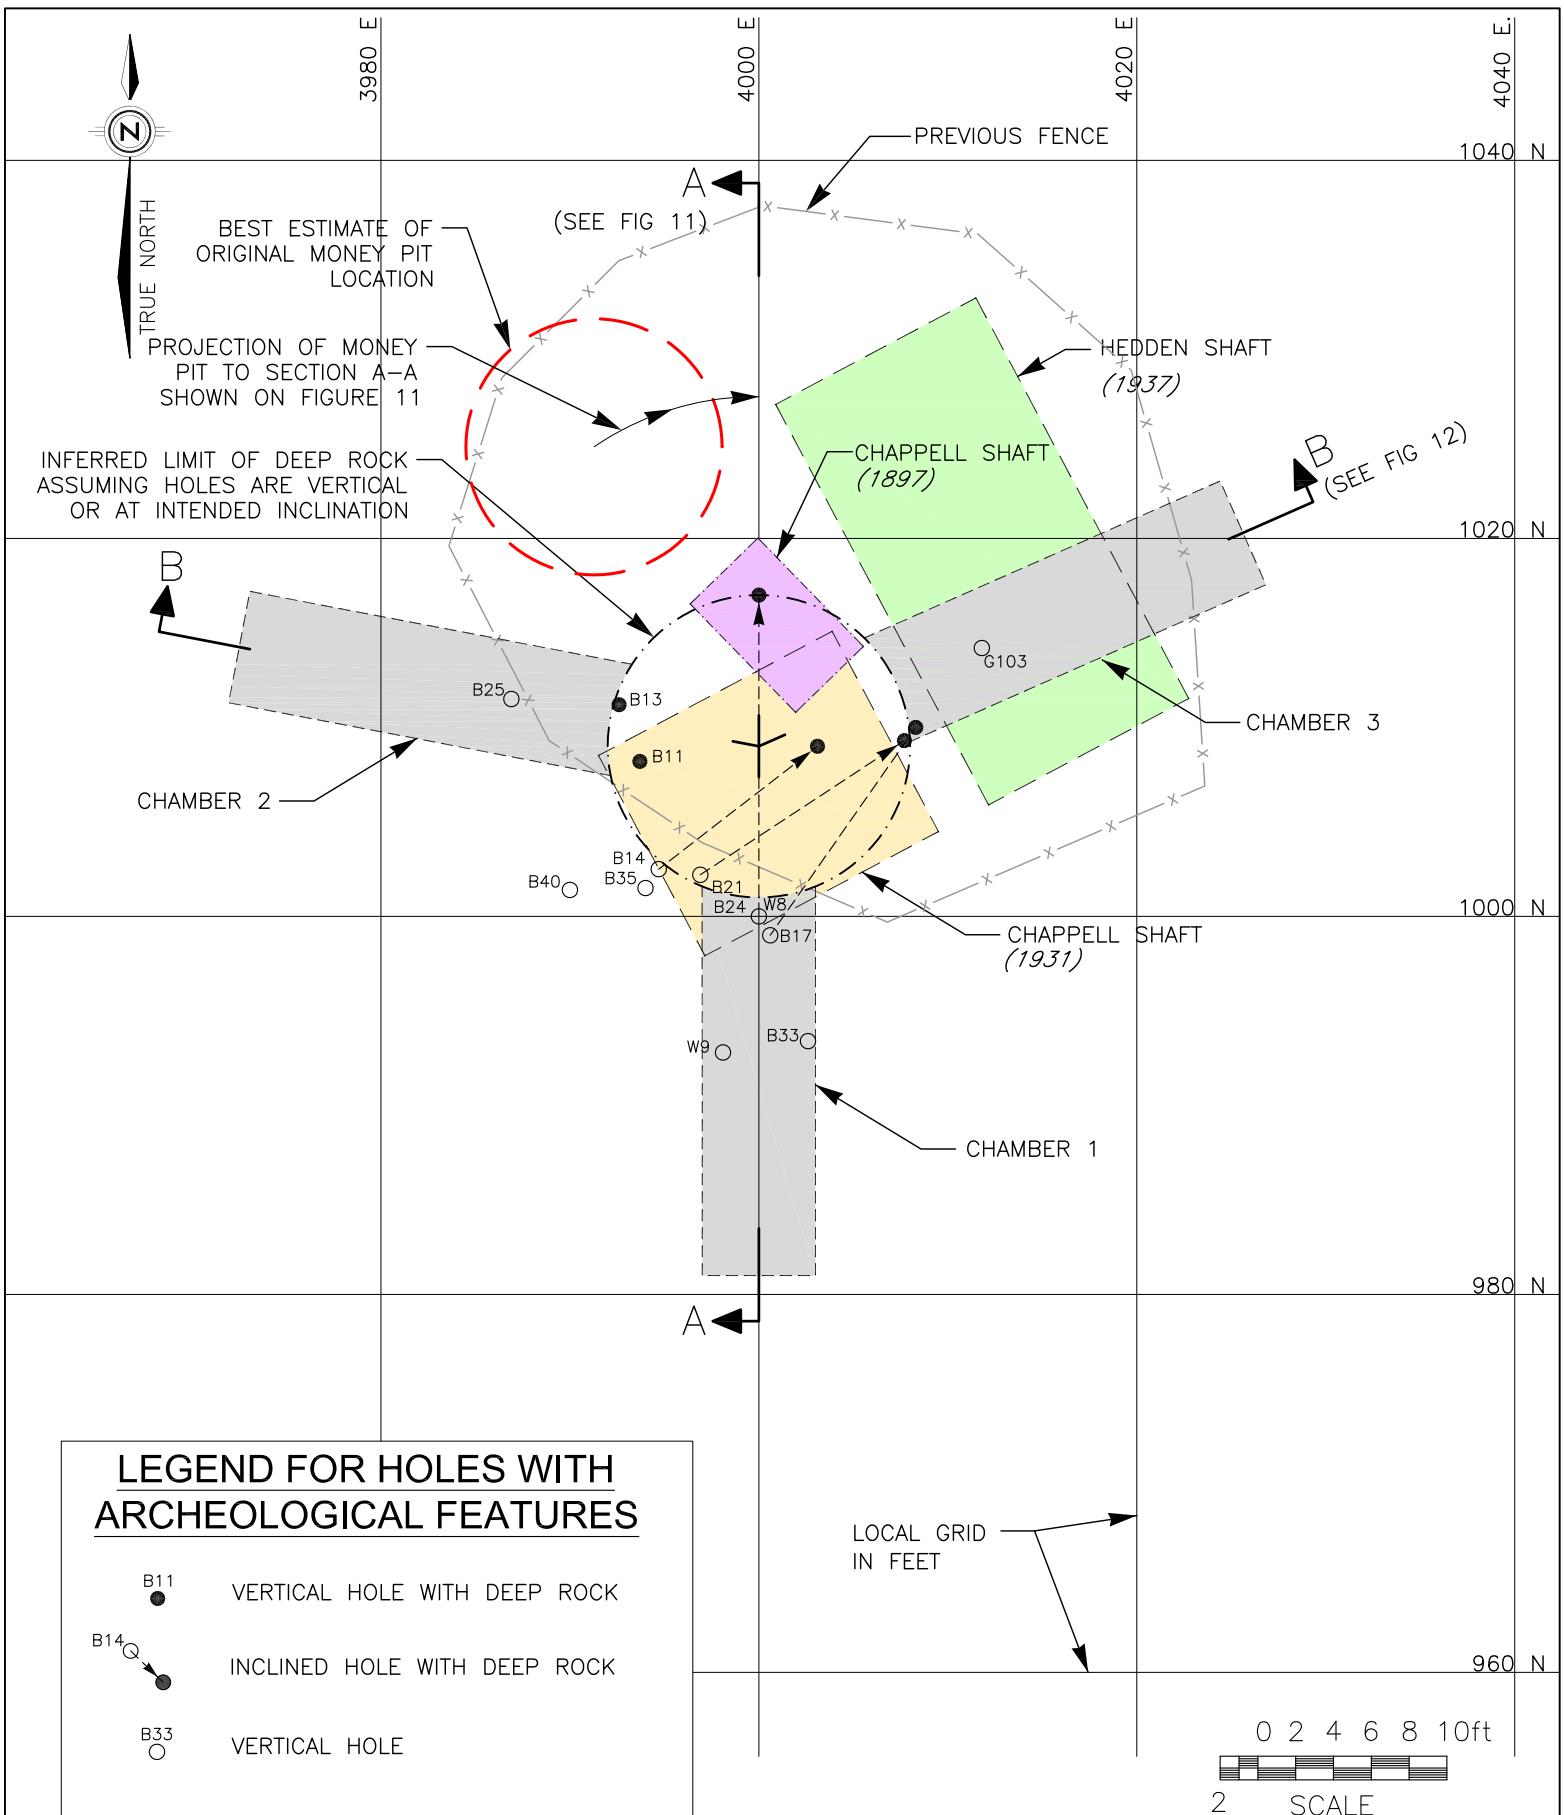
PLAN SHOWING MONEY PIT RELATIVE TO DEEP ROCK AREA AND CHAMBERS
